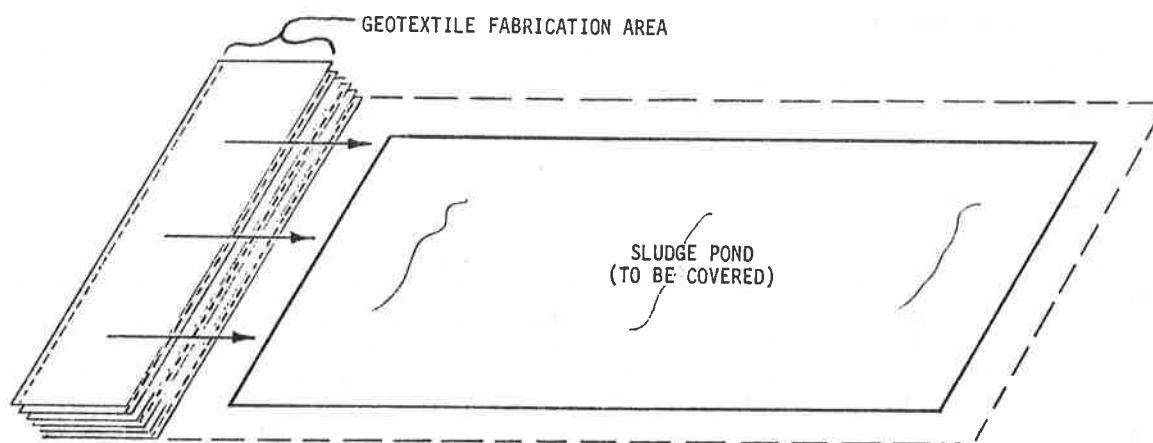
TYPICAL GEOTEXTILE CLOSURE PROJECT LAYOUT
